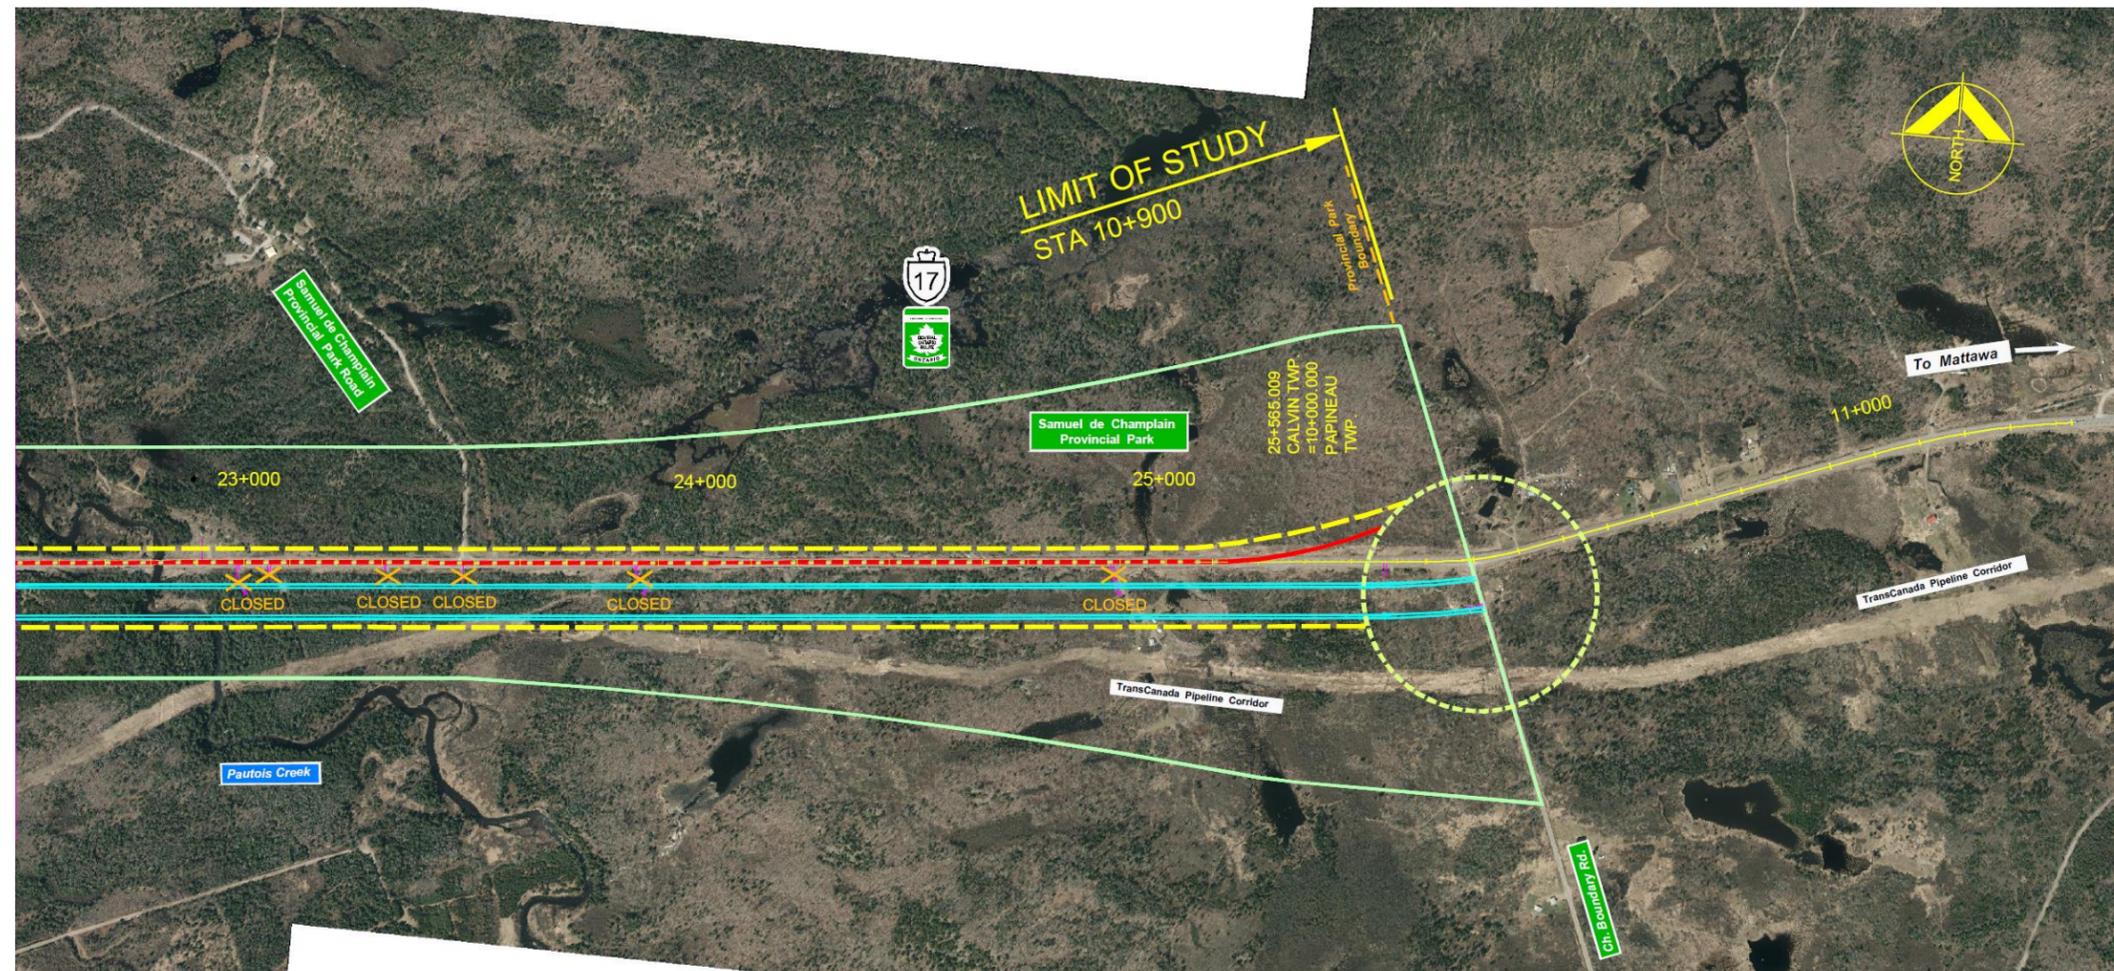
Alternative 2 Pautois Creek Area - South Side Widening
